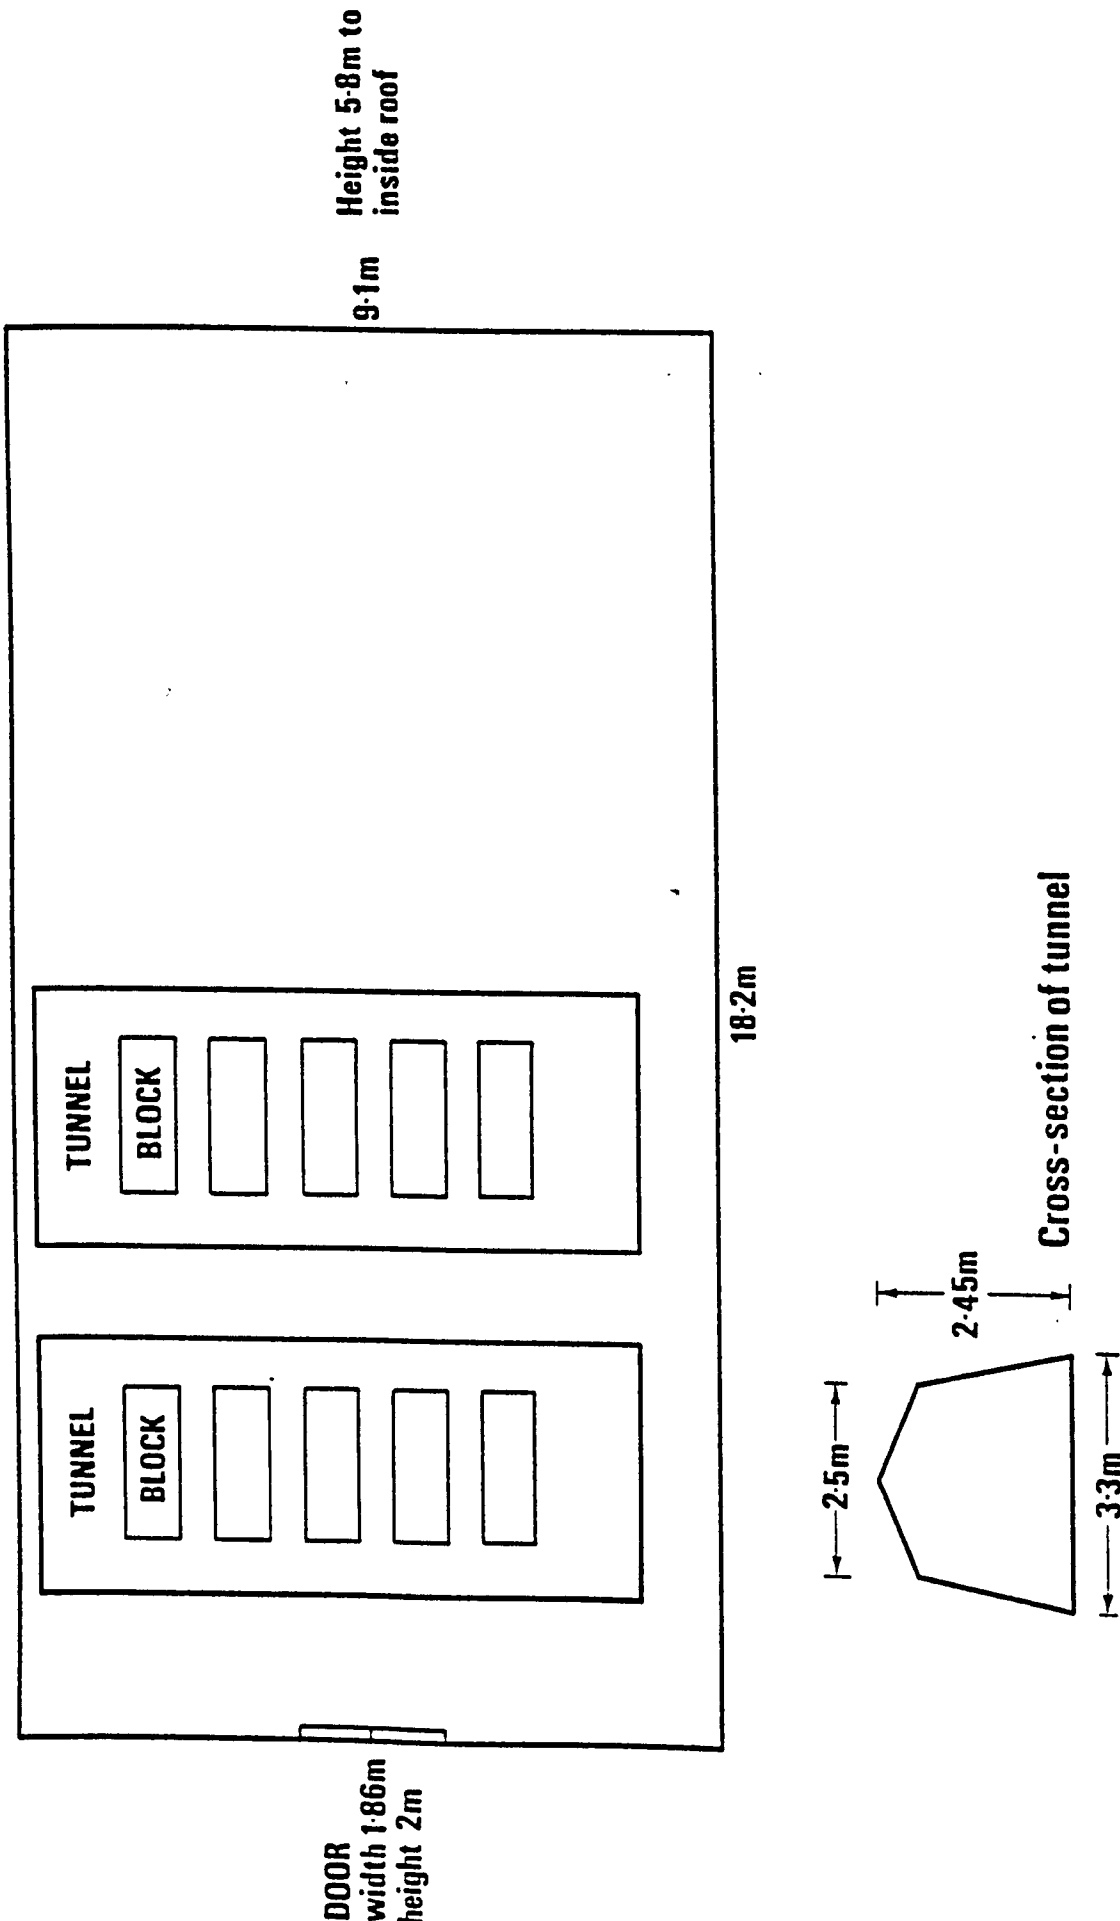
Igloo shelter used to construct tunnel within welding grid
